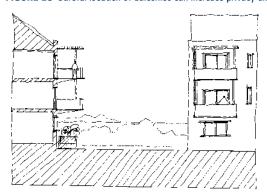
Ensure adequate separation between unscreened balconies Privacy at ground floor level provided by suitable sill heights and planting
